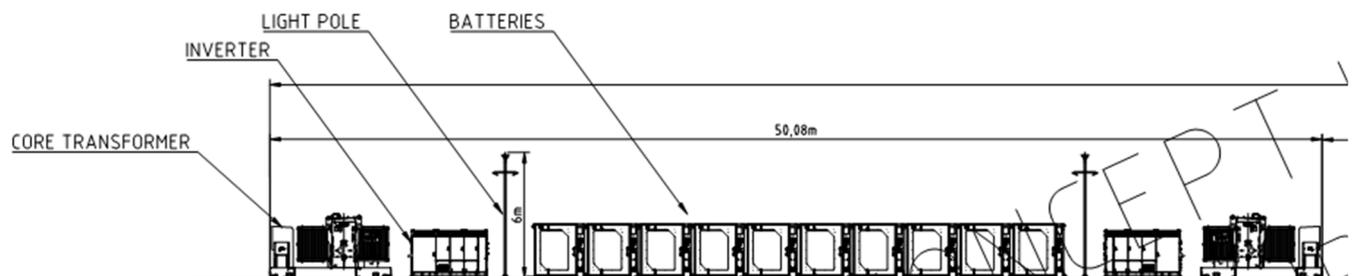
From Cranbourne BESS Planning Layout Sheet 3
